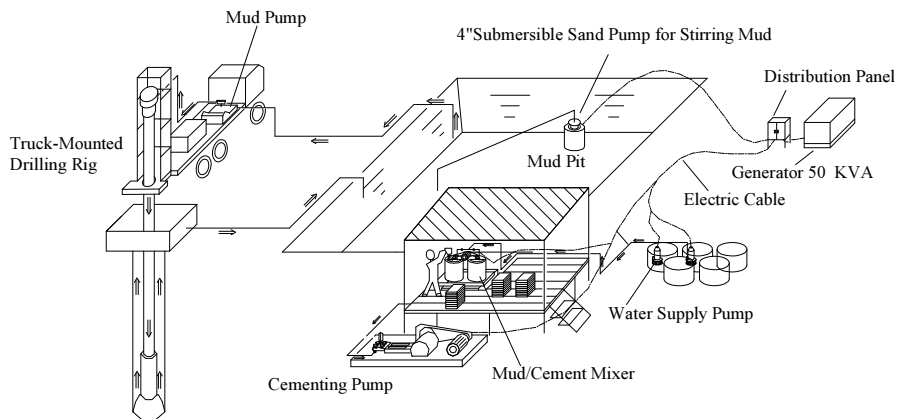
Conceptual Drawing of Arrangement of Drilling Equipment on Site (for Handpump Wells)
